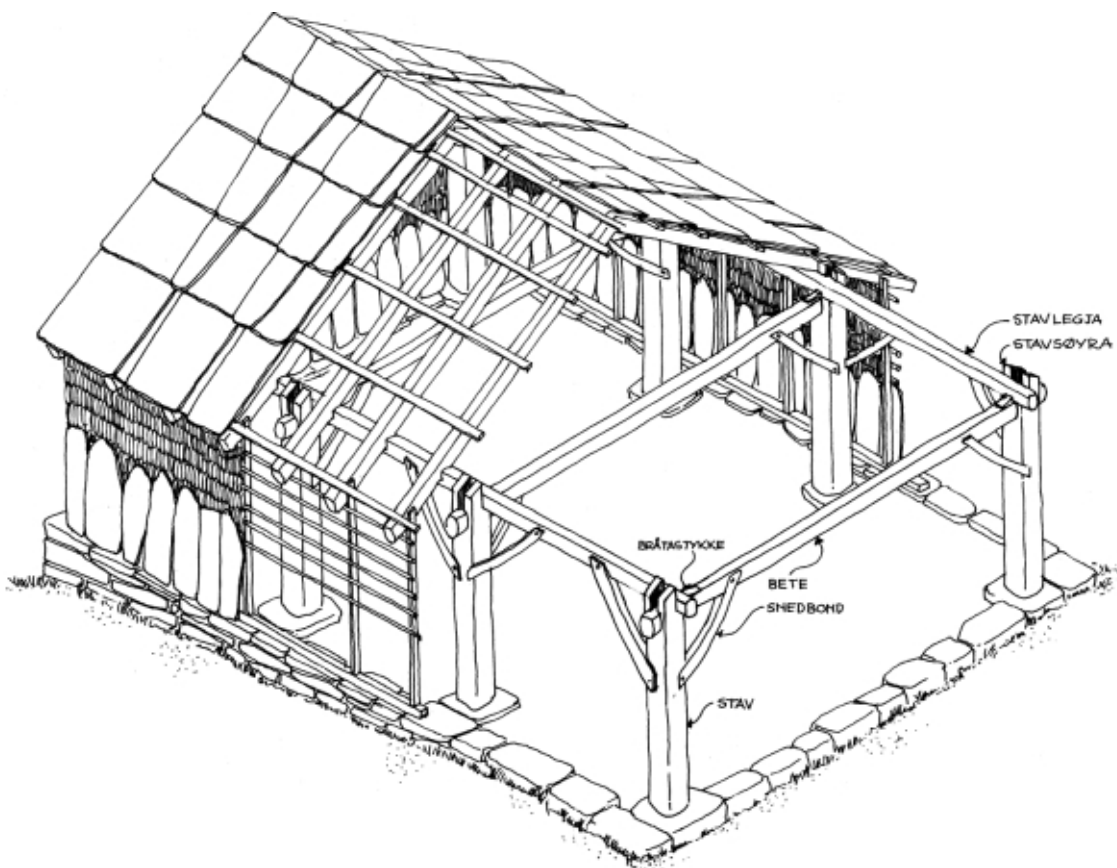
An example of a hay barn built using the Norwegian trestle-frame construction technique (isometric section).
